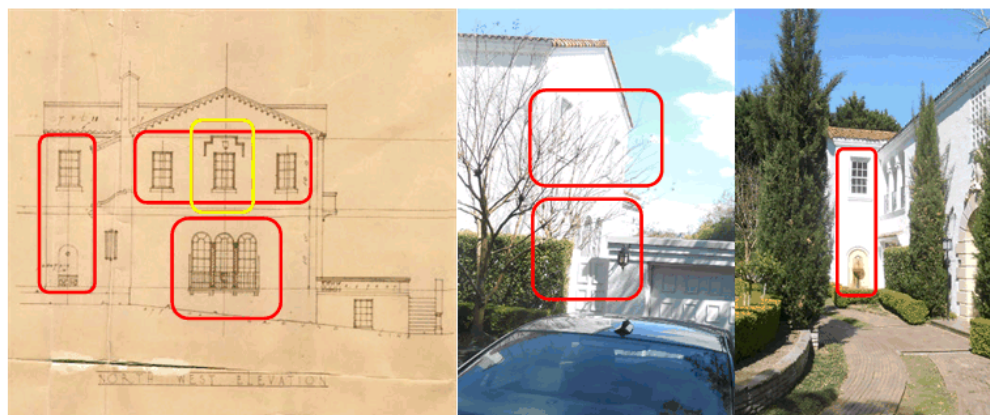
(L) Northern elevation of the 1928 Gilling Plan, (C) oblique view of the northern elevation gable element, and (R) the Gilling Scheme window and fountain element, 2015. Note the central opening to the upper level window has been filled in during the 1960 scheme.
